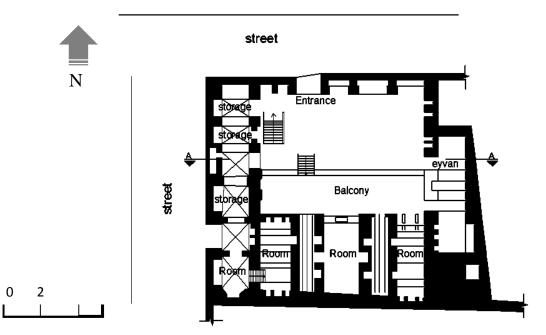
Ground-floor plan of a traditional building in Dezful (Ghobadian, 2009)
